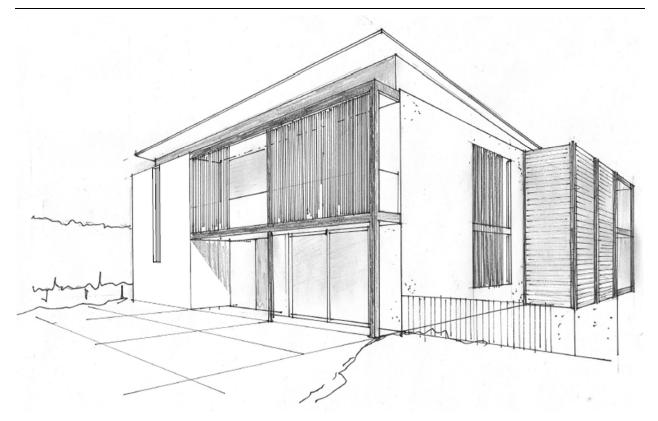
Sketch of the dwelling's northern elevation (view from the lower lawn)
